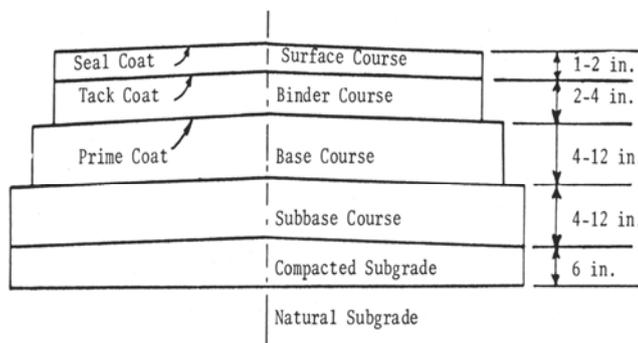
Typical Cross-section of Conventional Flexible Pavement
